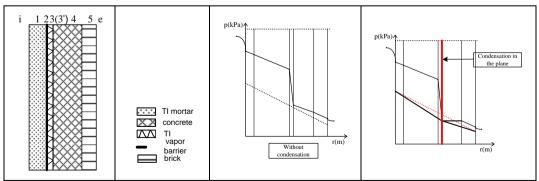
The assembly layout and water vapor diffusion diagrams in the assembly 4
